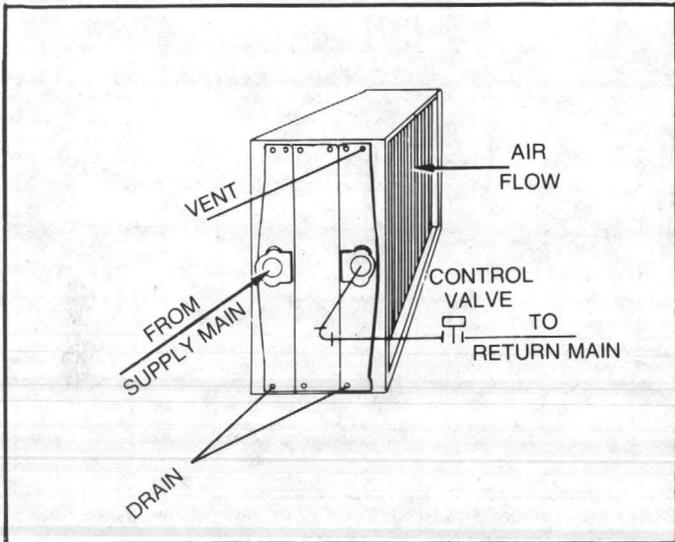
Typical Piping for Type DD Water Cooling Coil with Center Connections.
